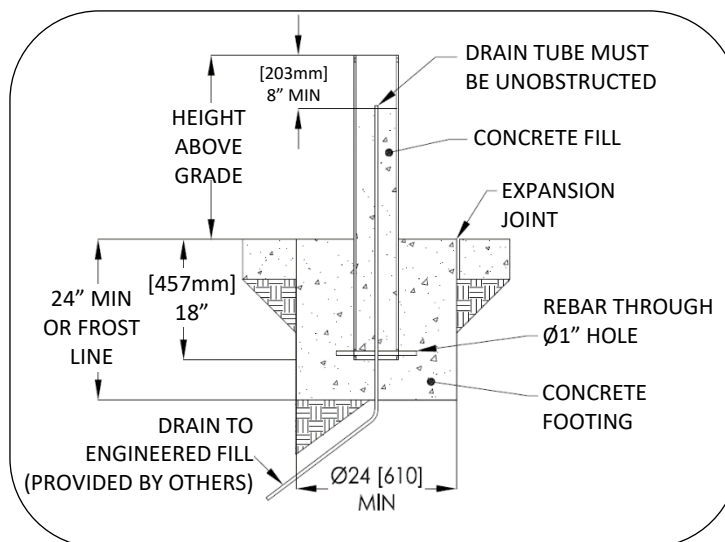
ALT FOOTING FOR EMBEDDED BOLLARD WITH INTERNAL CONCRETE FOR MINIMUM SECURITY
